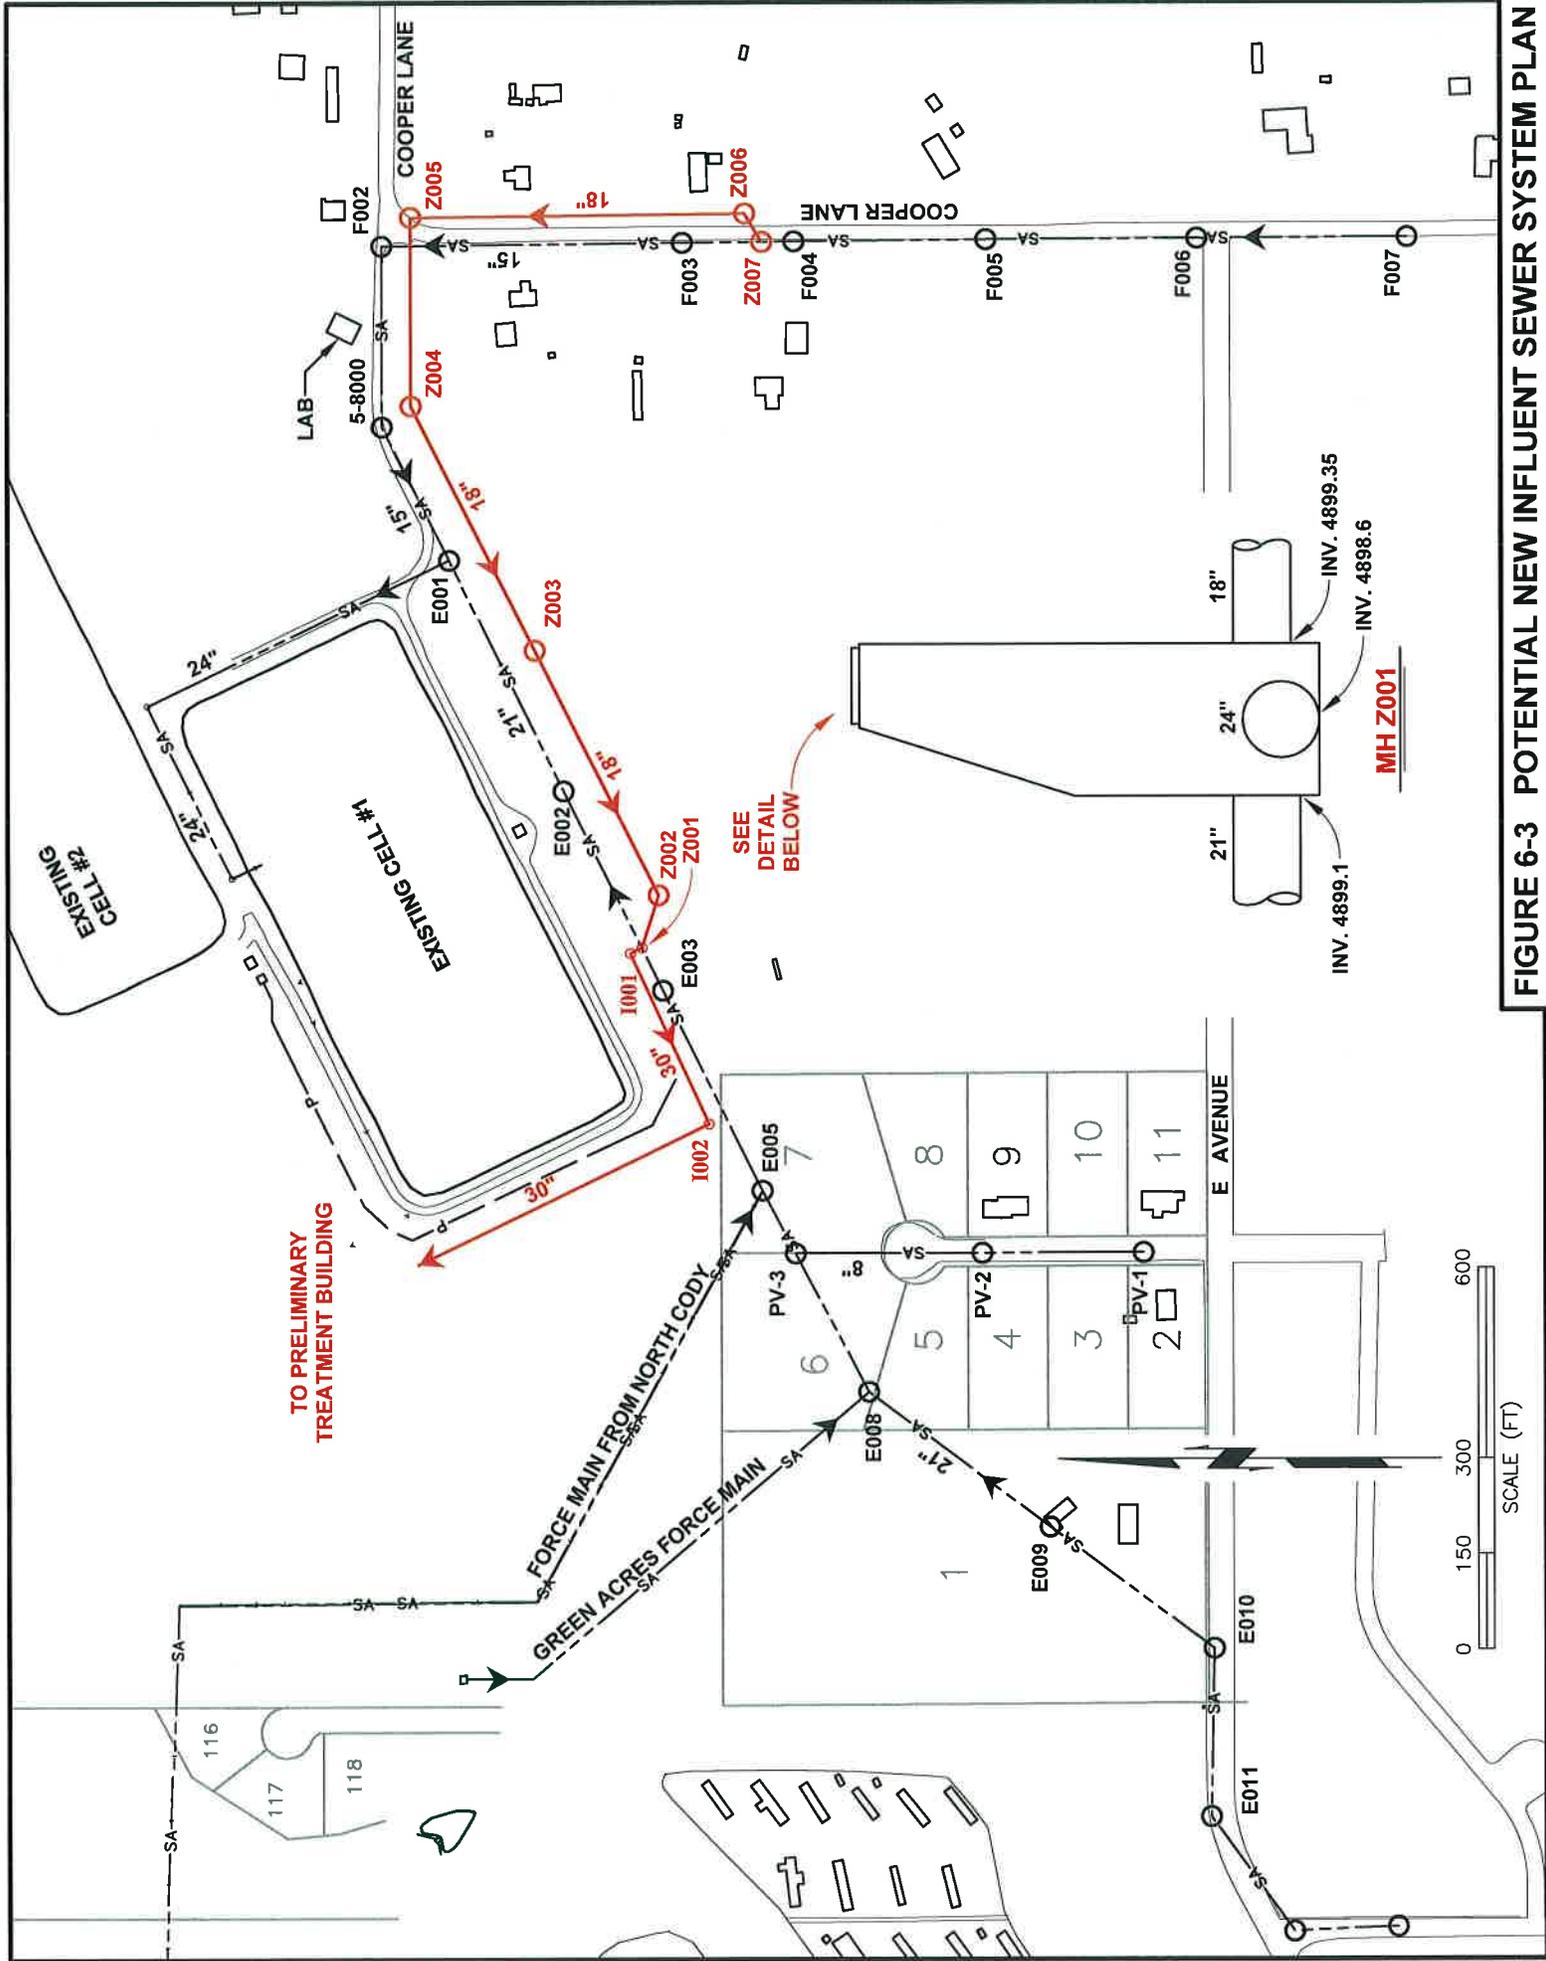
POTENTIAL NEW INFLUENT SEWER SYSTEM PLAN
